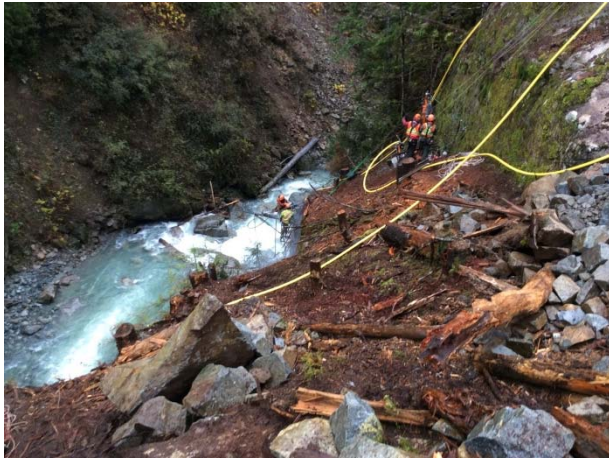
Rope access crews conduct stabilization works on right bank at BDRHEF intake (October 26, 2014).
